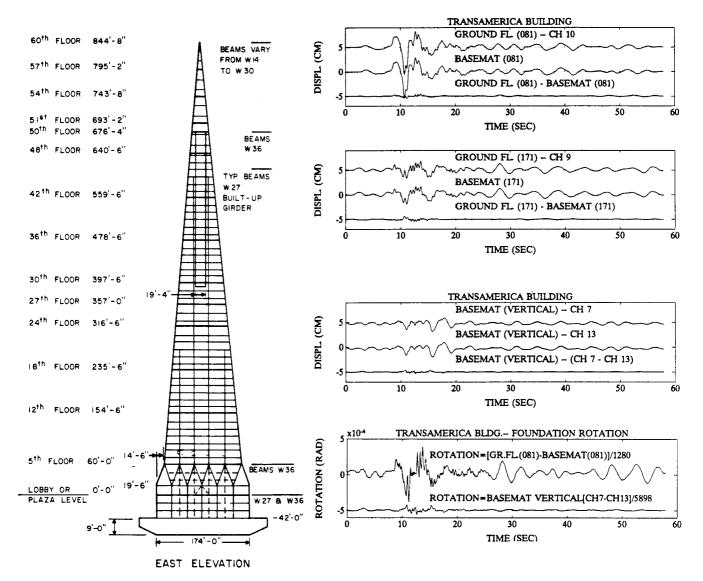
Rotation of basemat and basement walls at Transamerica Building.
